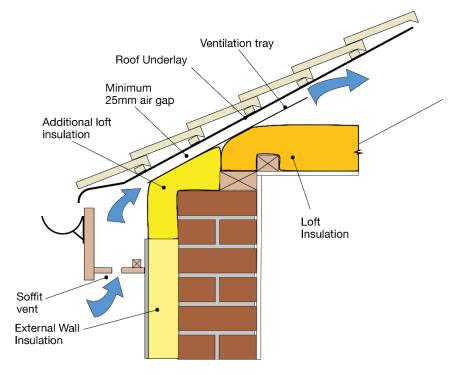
Standard Eaves on a sold wall with Roofline Extension to provide suitable overhang whilst maintaining adequate loft ventilation with additional loft insulation added to mitigate the thermal bridge.
